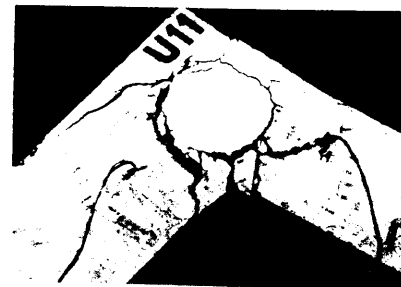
Corner Reinforced with Loops (At Failure, Cracks Run Along Reinforcement Loops and Concrete Outside Reinforcement Is Pushed Off)
